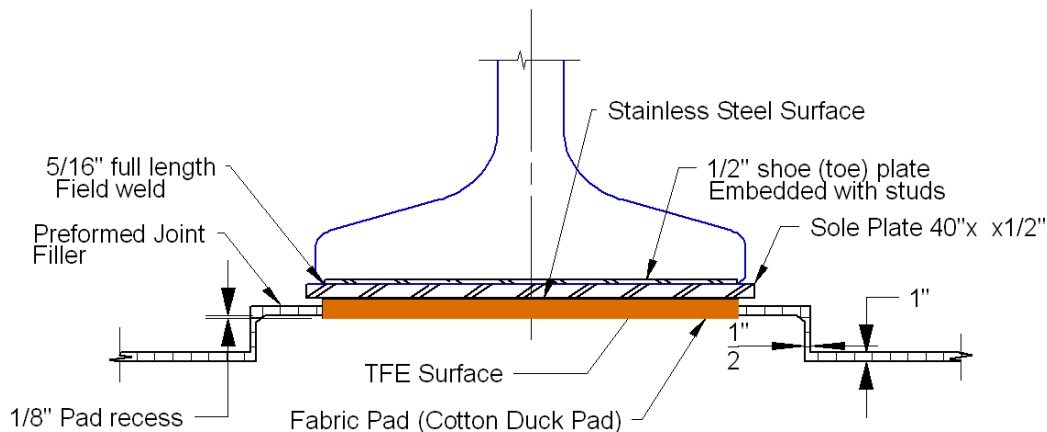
Standard Nebraska bearing details for expansion bearings, using stiff wide fabric pads and separate Teflon/stainless steel sliding assembly. Stepped pedestals and concrete diaphragms transversely restrain the girders.
